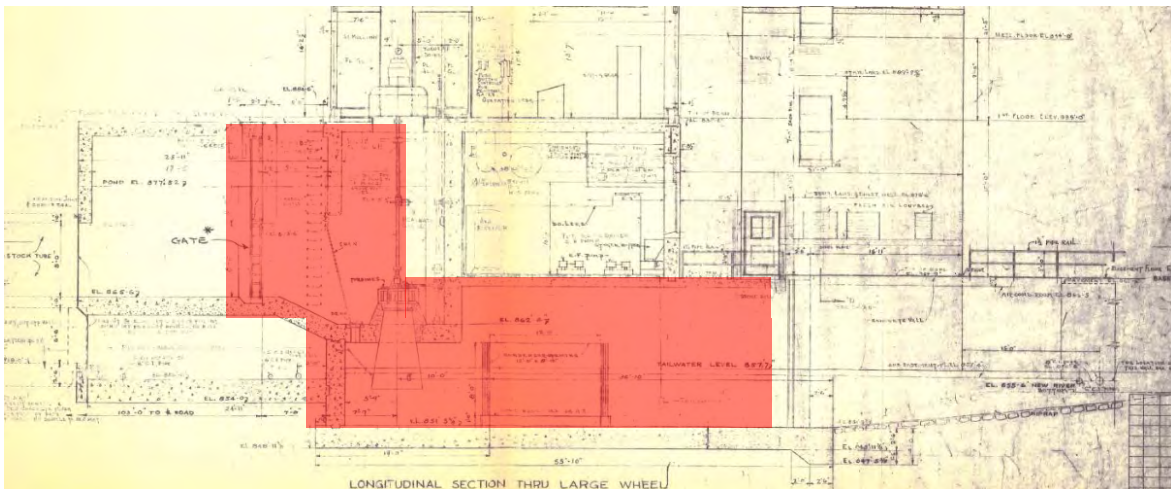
Powerhouse Basement Wall and Draft Bay - Section Looking Left
